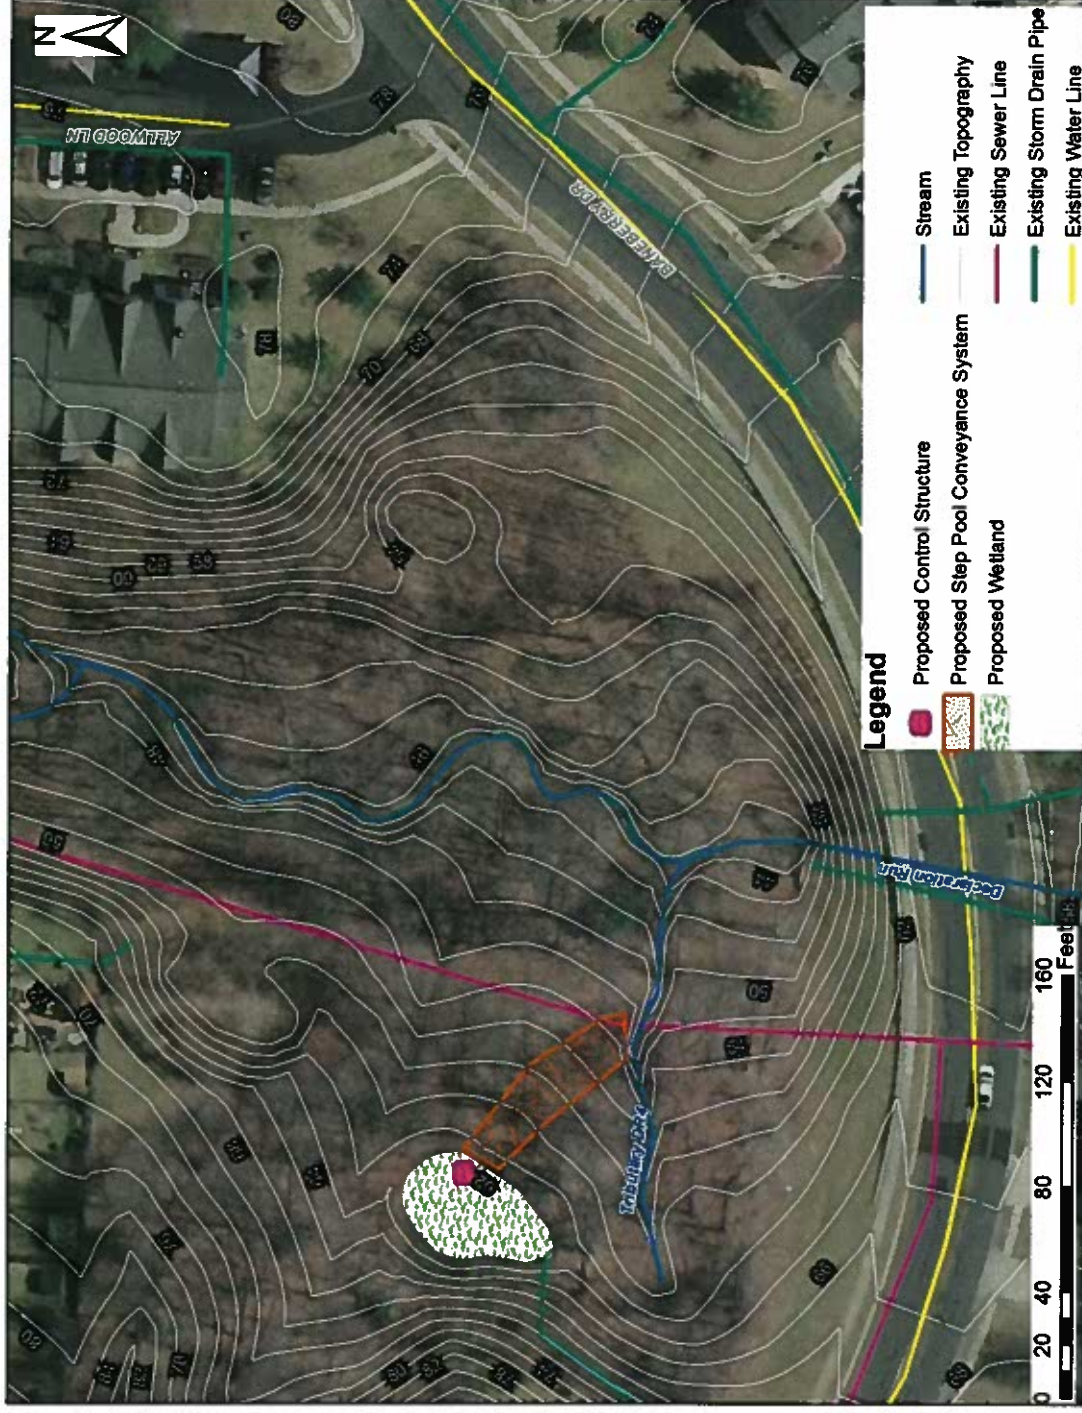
Proposed structural stormwater improvement at site D-ES-8
